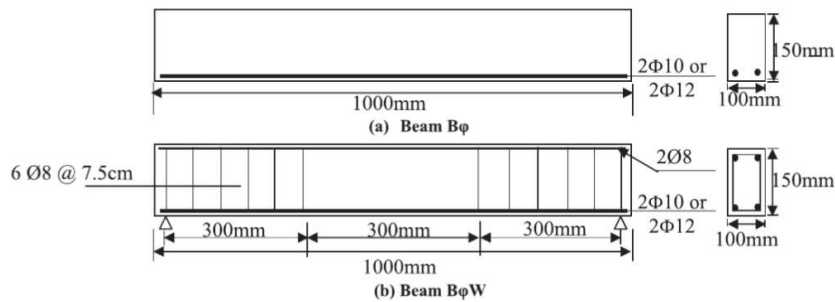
Sketch of geometry and reinforcement information of the two test beams
